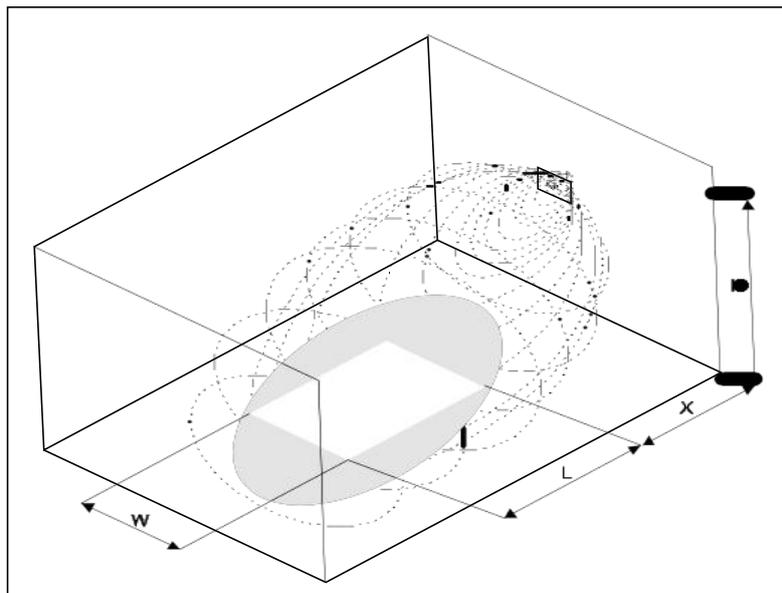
Typical rectangular floor area when installed at 15°
